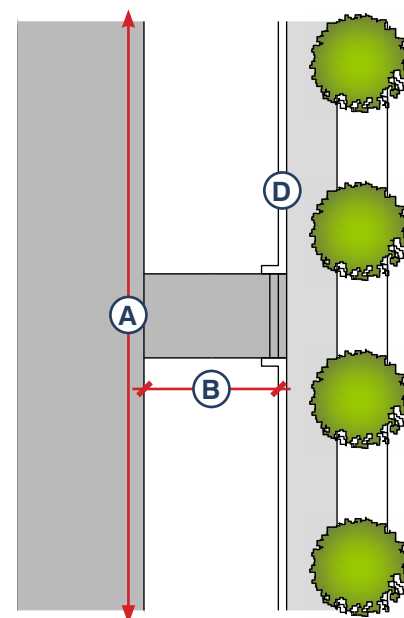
DOORYARD FRONTAGE PLAN VIEW DIAGRAM
